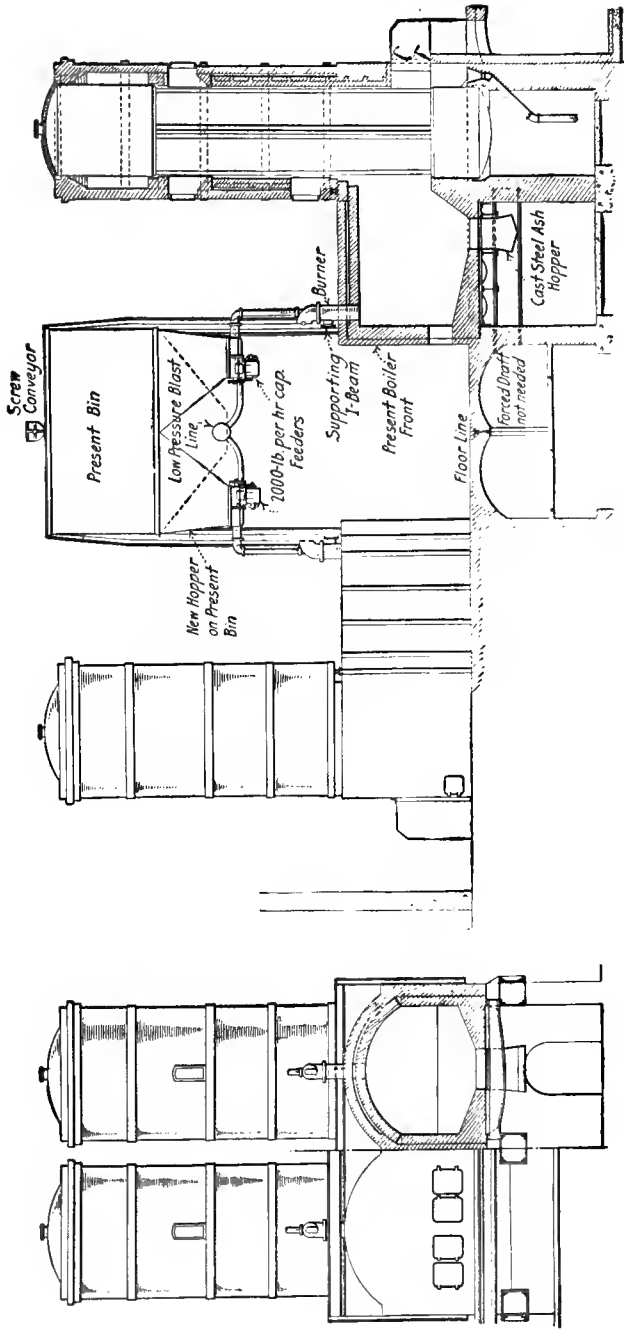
Powdered Coal Equipment for Wickes Boiler.
